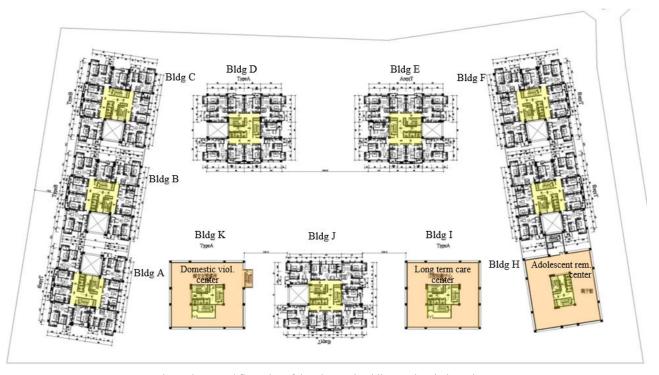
The second floor plan of the Chung-Li Public Housing design scheme
